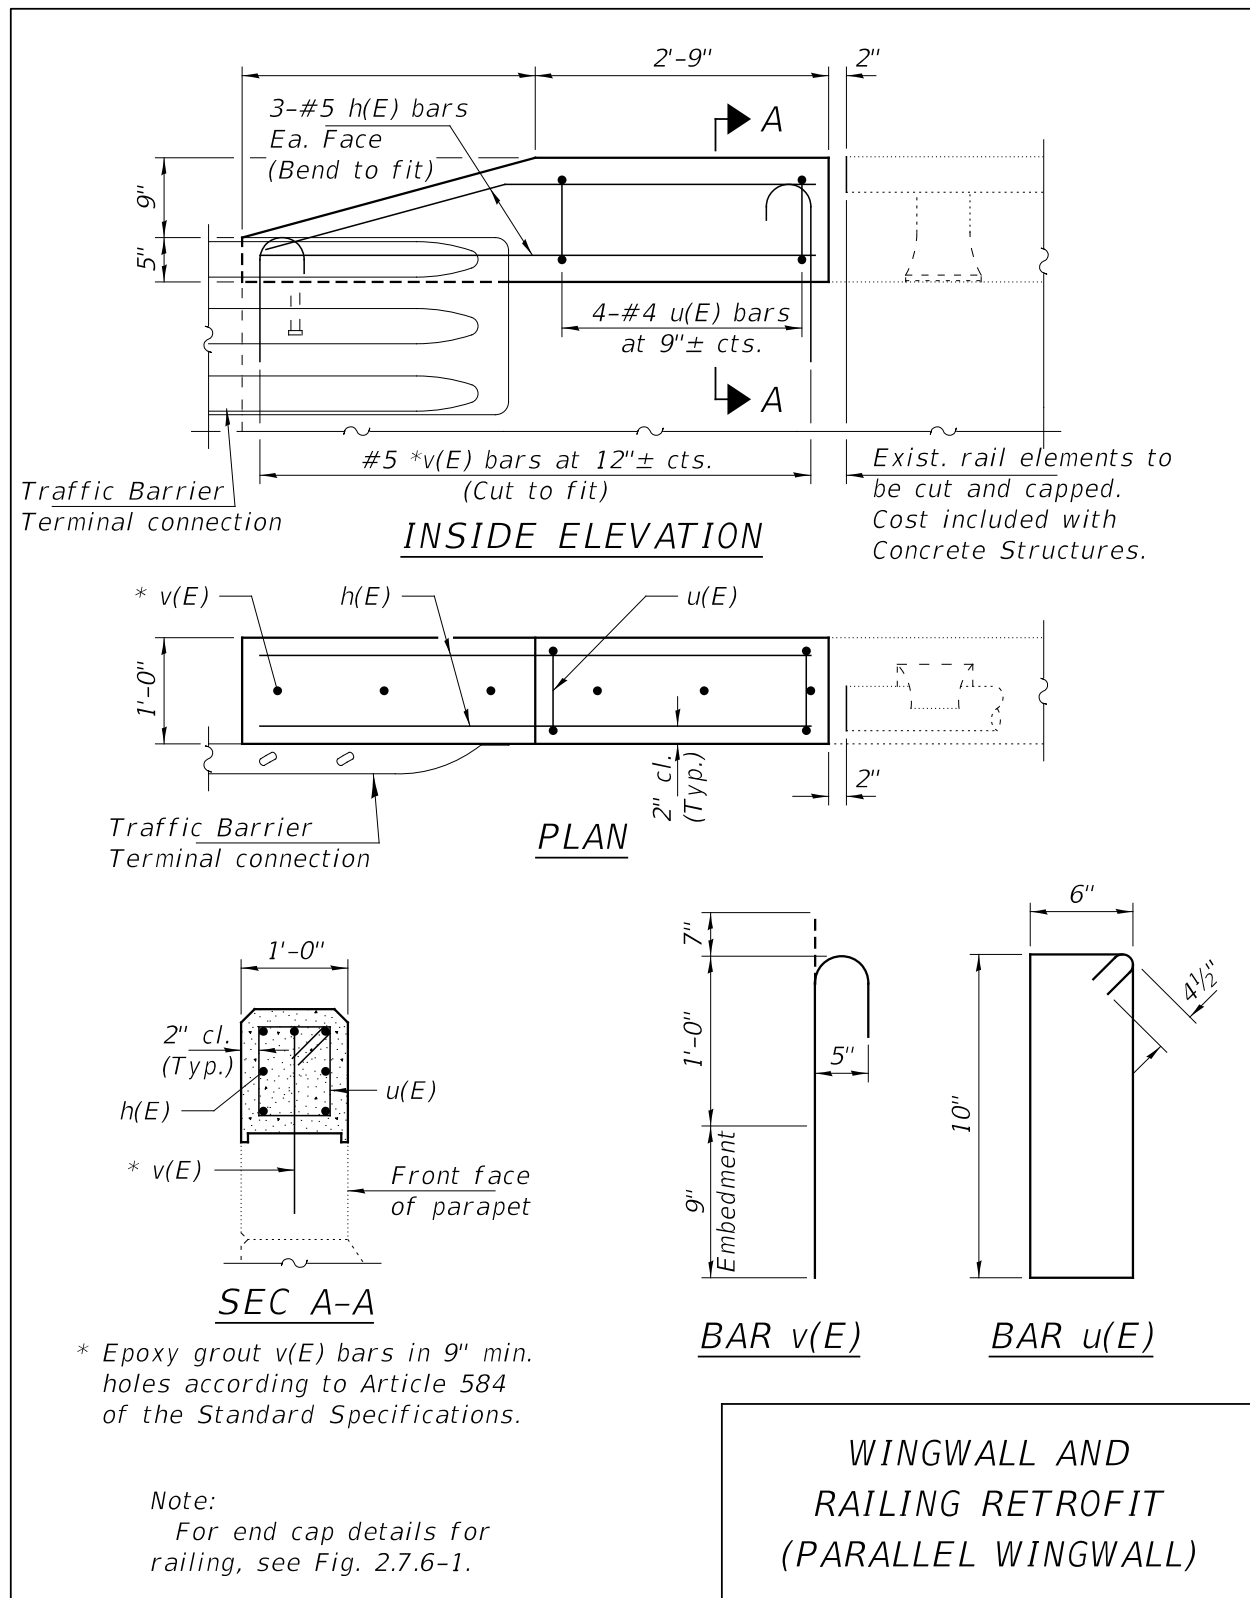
Wingwall and Railing Retrofit (Parallel Wingwall)
